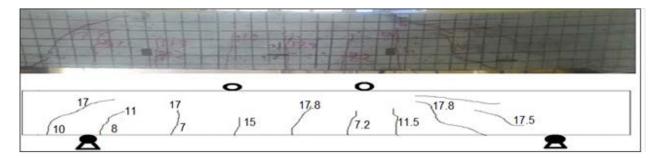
(b) - Cracking pattern of 20P5E beam specimen
